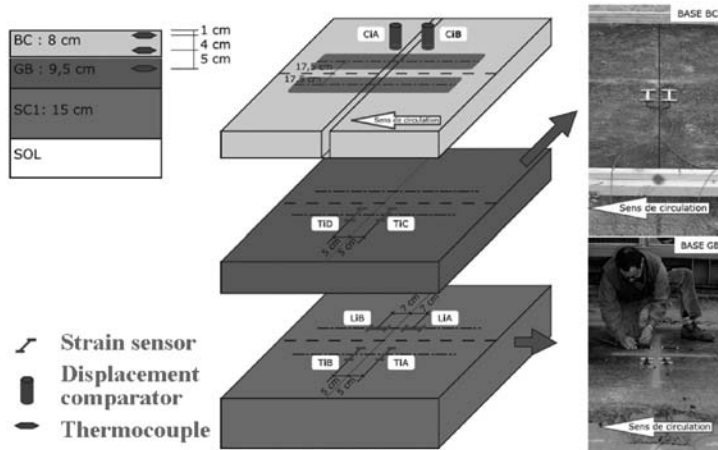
Instrumentation of the “i” joint of the composite pavement test section (Pouteau, 2004a).
